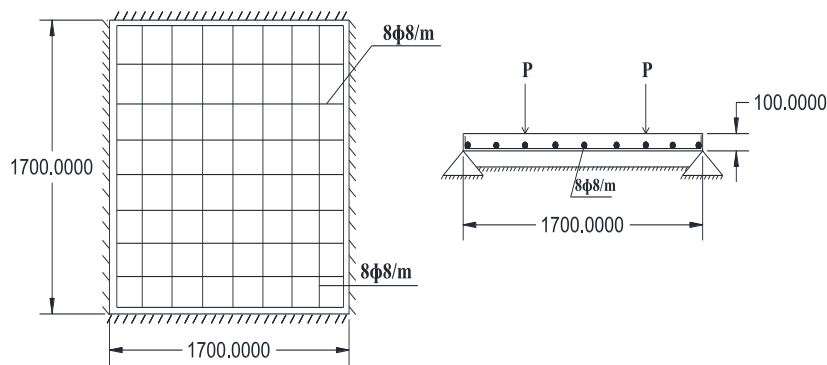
Reinforcement and Concrete Dimensions of Slab S2-1
